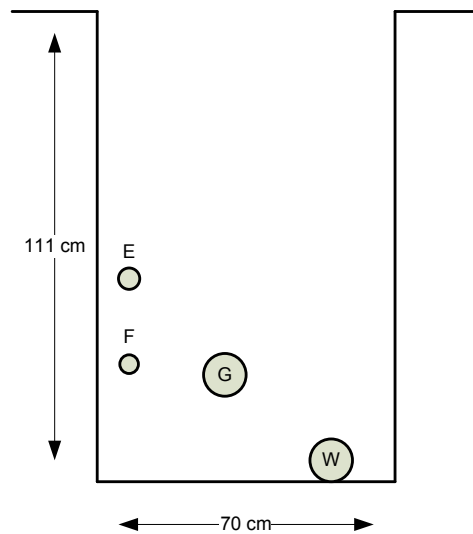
Trench cross-section under greenfield rollout with all infrastructures
